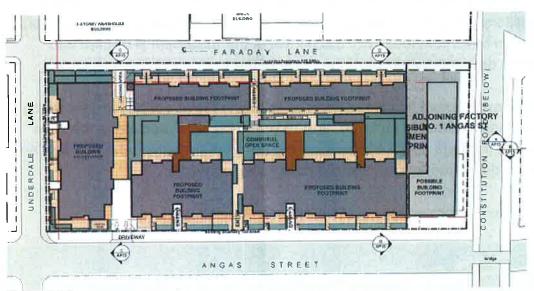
Layout of the development. This illustrates that the development consists of 5 separate buildings.
